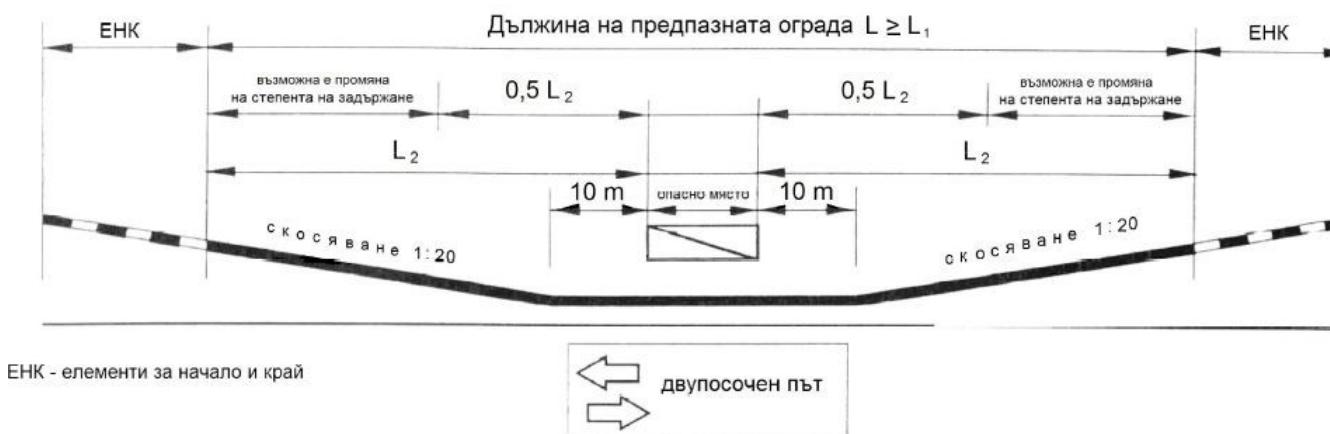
Minimum length of a road restraint system executed by two-sided beveling before and after a hazardous location on a two-way road
